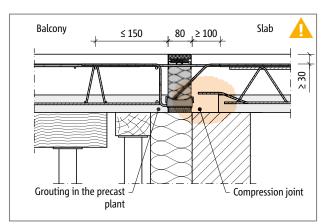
Schöck Isokorb® T type K/KF: Direct support, installation in conjunction with prefabricated slabs (here:  $h \le 170$  mm), compression joint on the floor side
